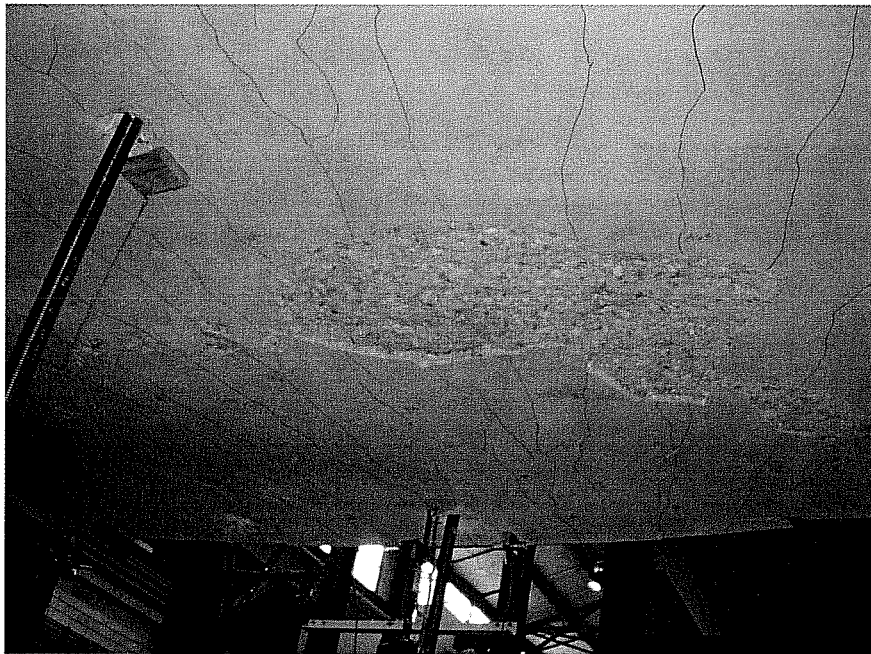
West exterior 10-ft bay failure surface at bottom of slab, facing south
